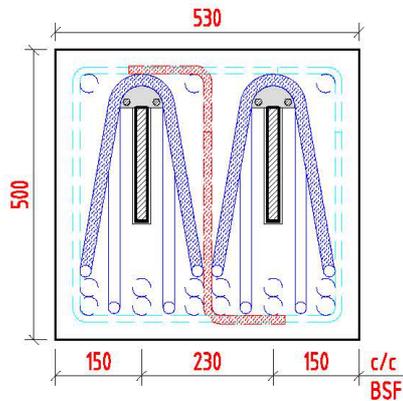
BSF 225 –Recommended minimum cross section and spacing between units when used in pairs.
